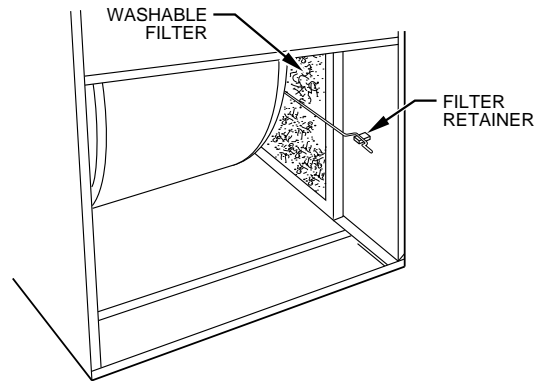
Side Filter Arrangement (Control Removed for Clarity)
